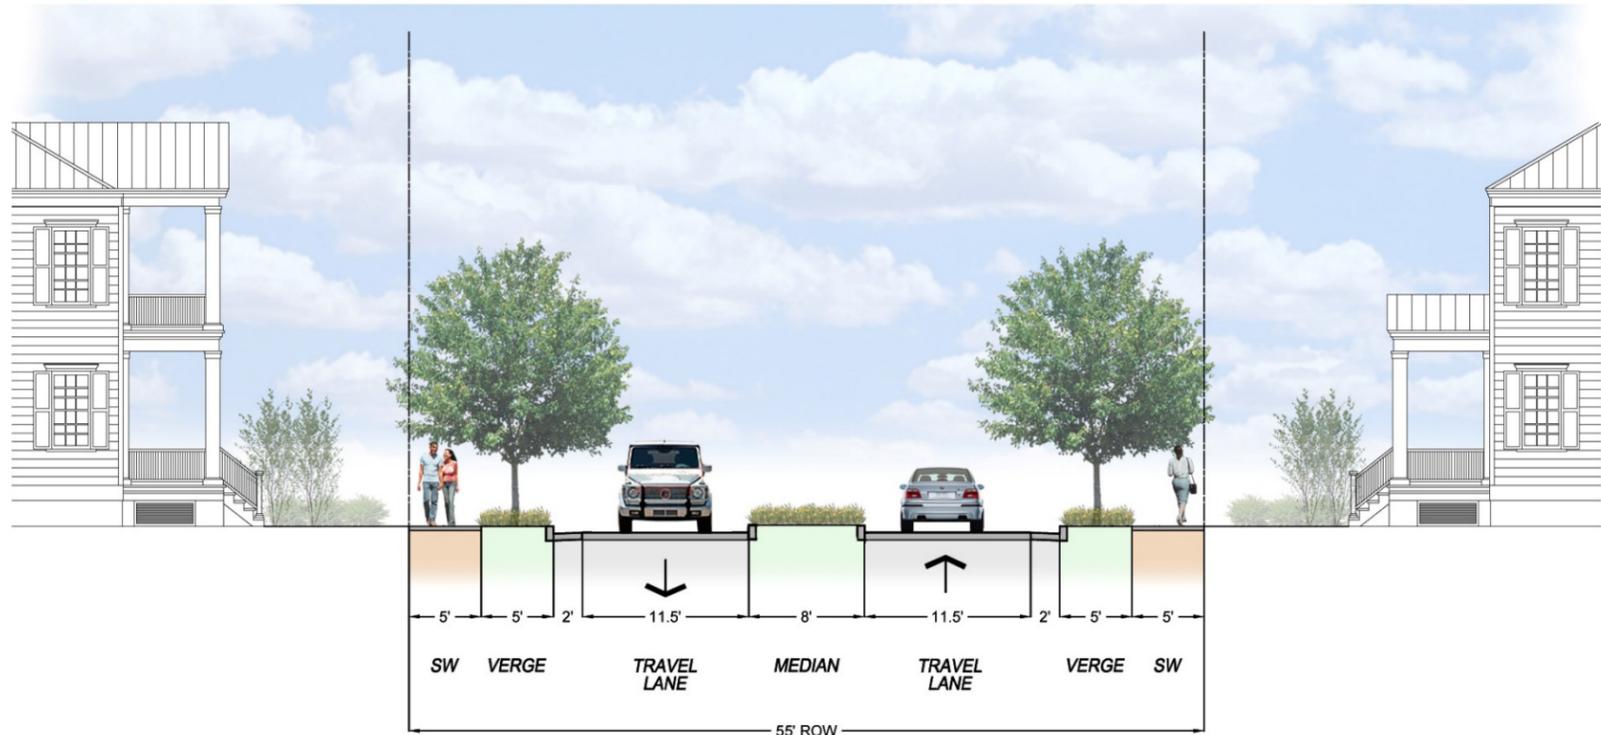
J: TYPICAL CROSS SECTION CC
